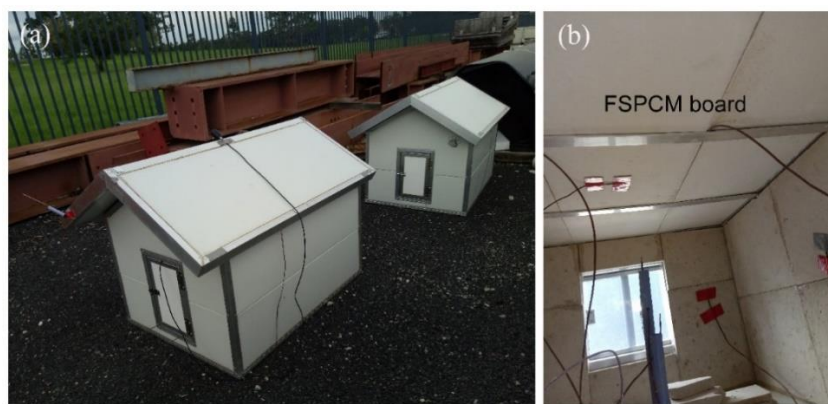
The appearance of the model house and installation of FSPCM boards: (a) model house appearance, (b) FSPCM board installation on the walls and ceilings.
